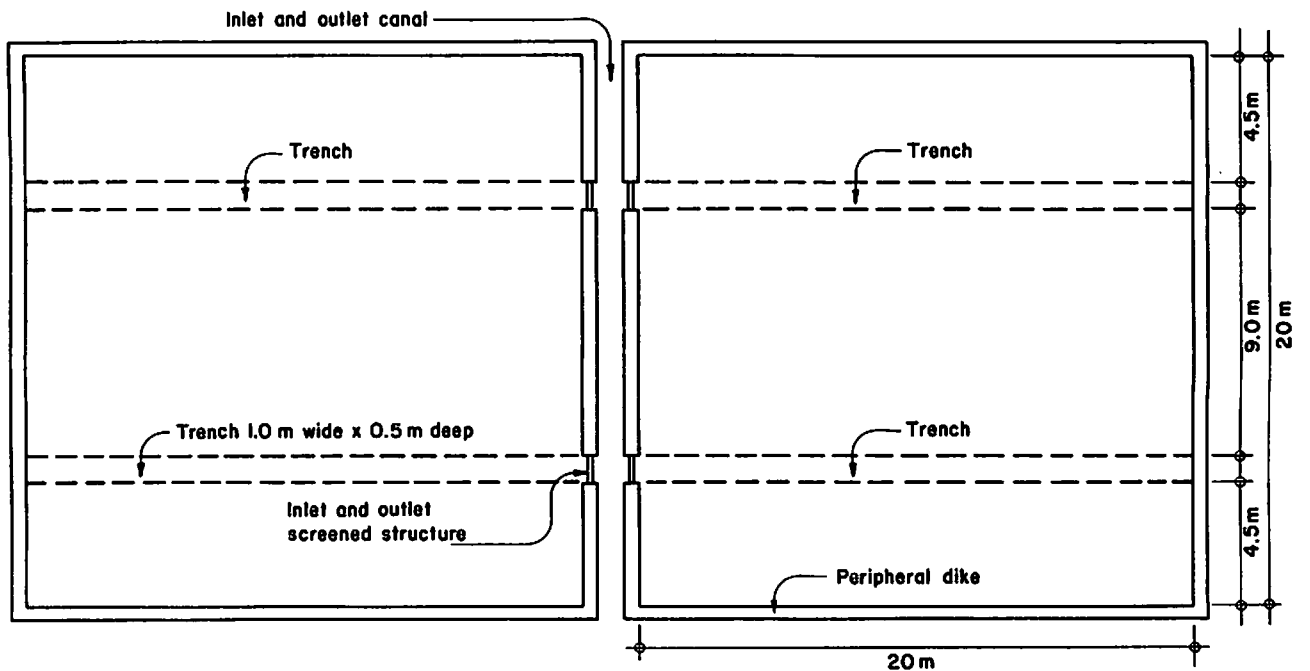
Location and spacing of trench for a 20m x 20m paddy. Scale 1:200.
